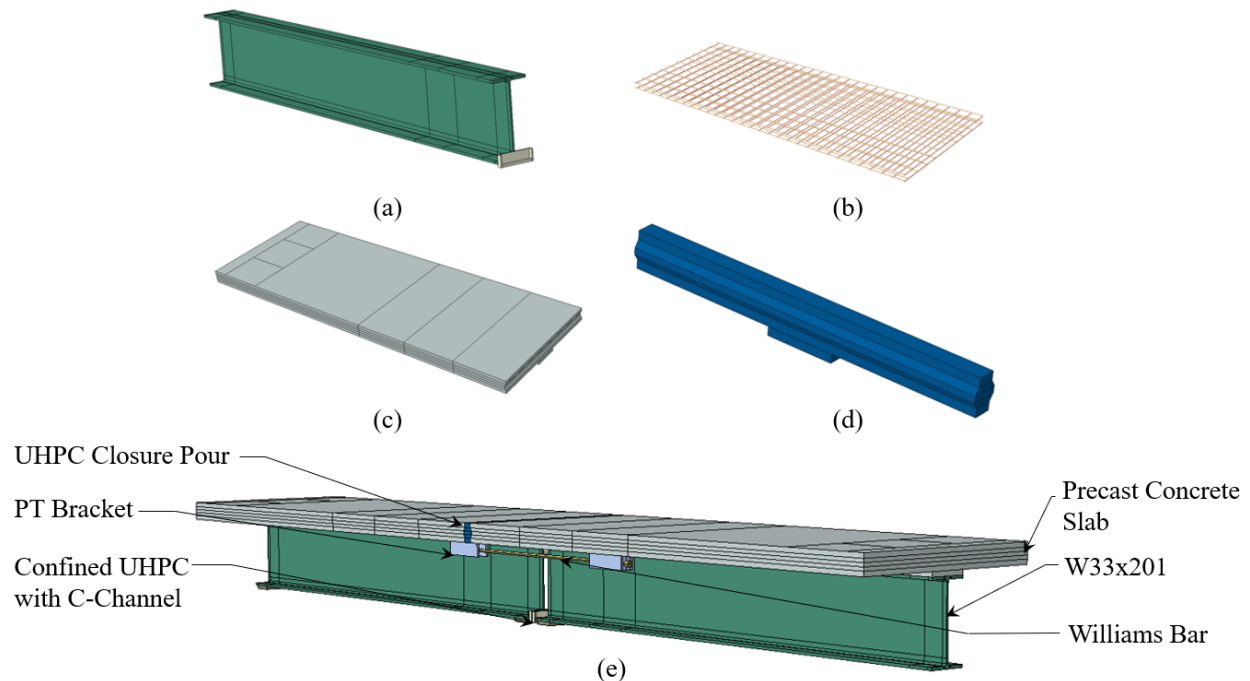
Concept B Test Setup Model Components: (a) Steel Girder with C-Channel, (b) Rebar, (c) Precast Concrete Deck, (d) UHPC Closure Pour, and (e) Assembly.
